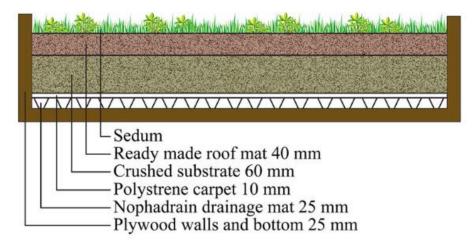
A cross section / elevation of an extensive green roof system (Source: Krebs et. al. *Simulation of green roof test bed runoff*. Hydrological Processes 30 (2016) 250–262)
